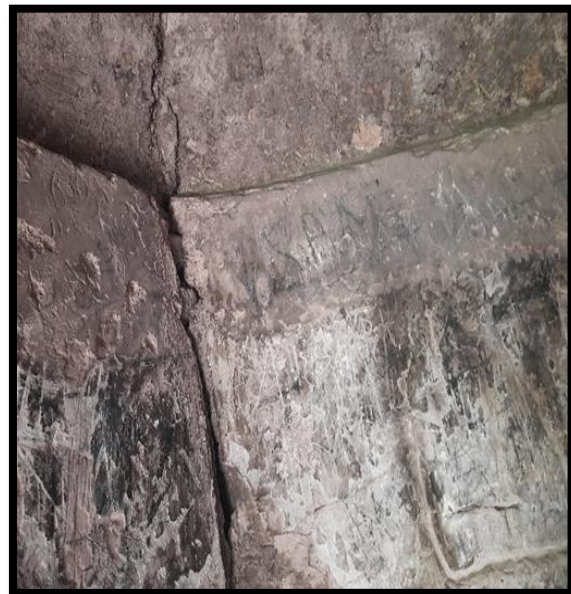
Damaged walls of Gulshan-e-Samadhi.
